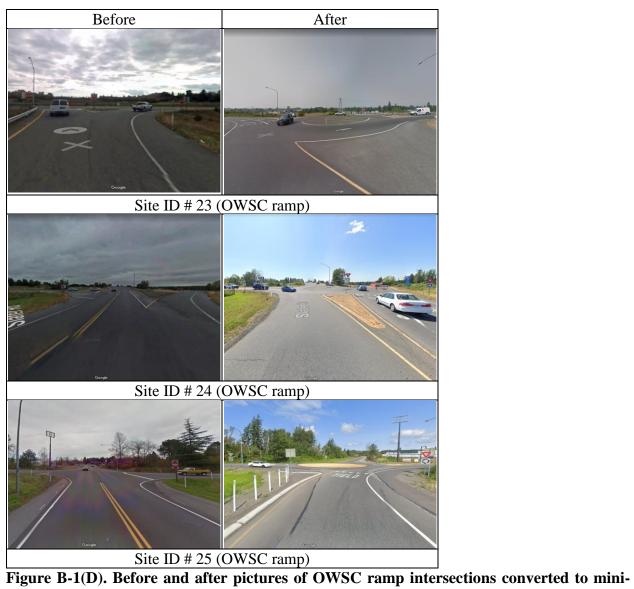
(D). Before and after pictures of OWSC ramp intersections converted to miniroundabouts (© Google street view).
